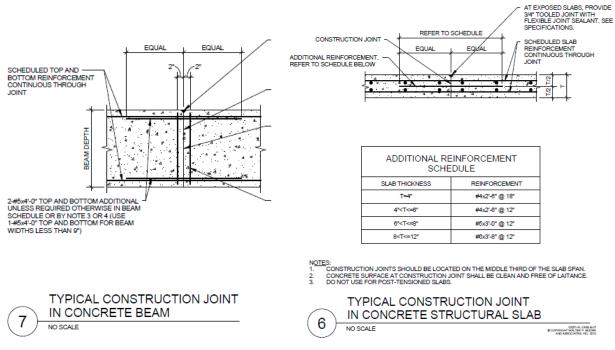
| Typical Construction Joints in Bed Tower Concrete Floor System (Courtesy of Walter P. Moore)
